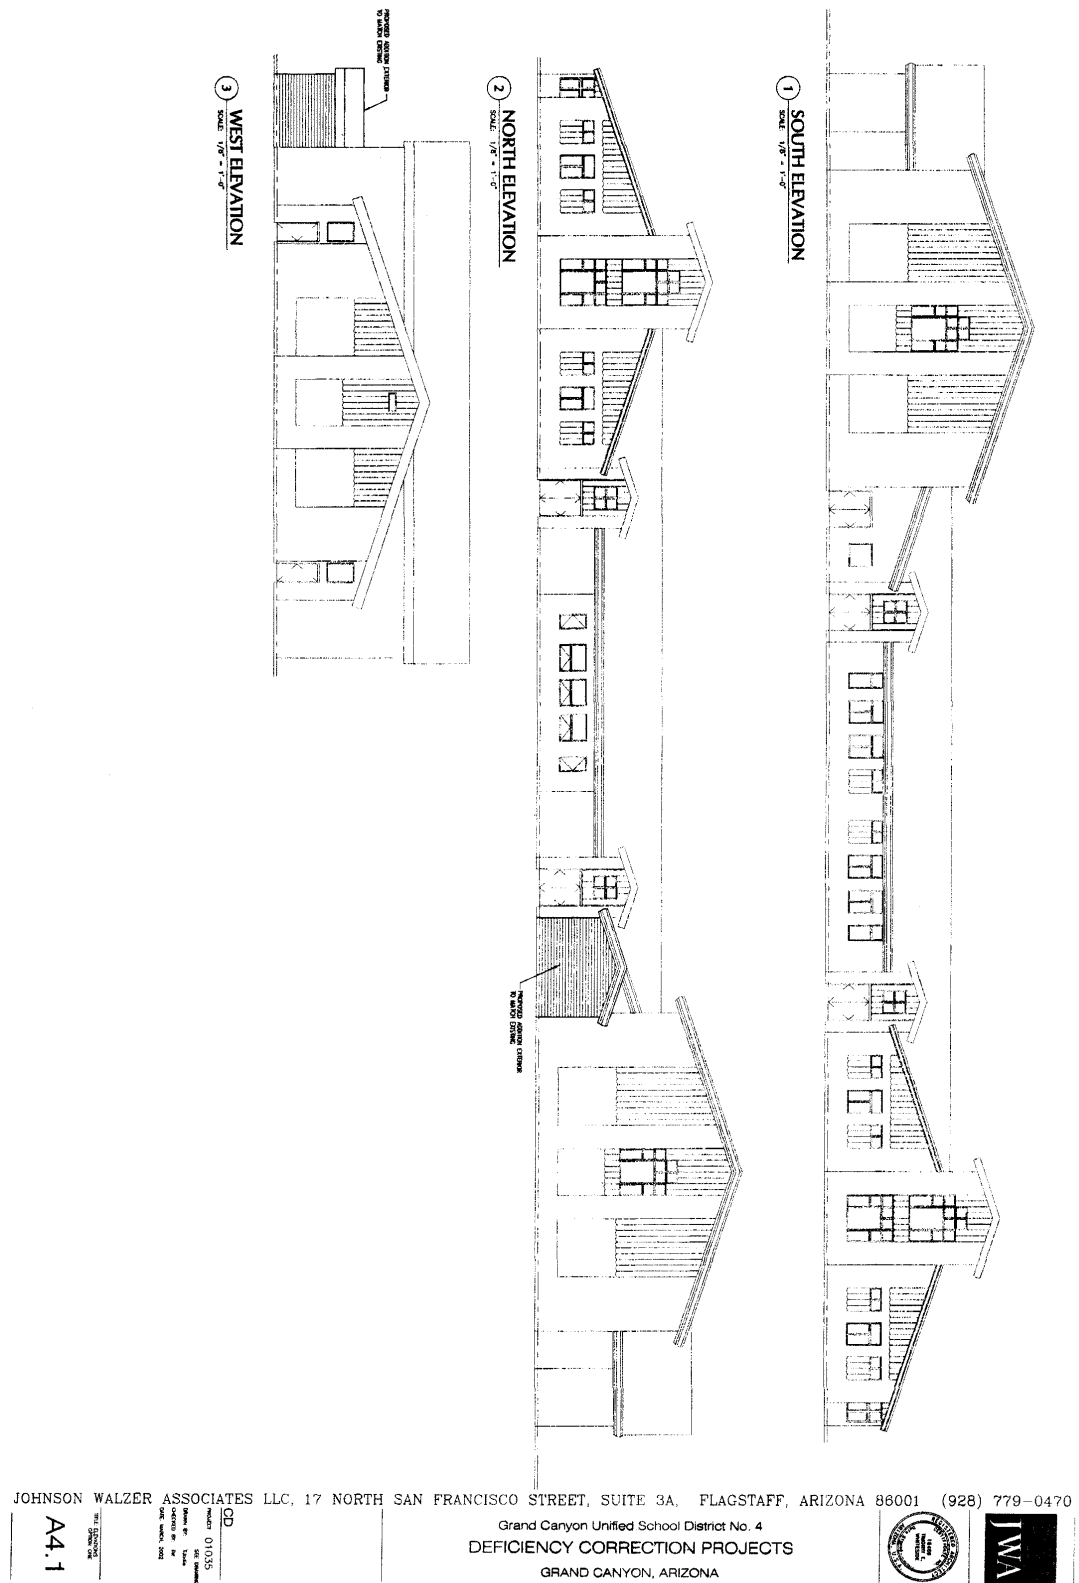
Proposed Elevation of the Multipurpose Building under Alternative D.
